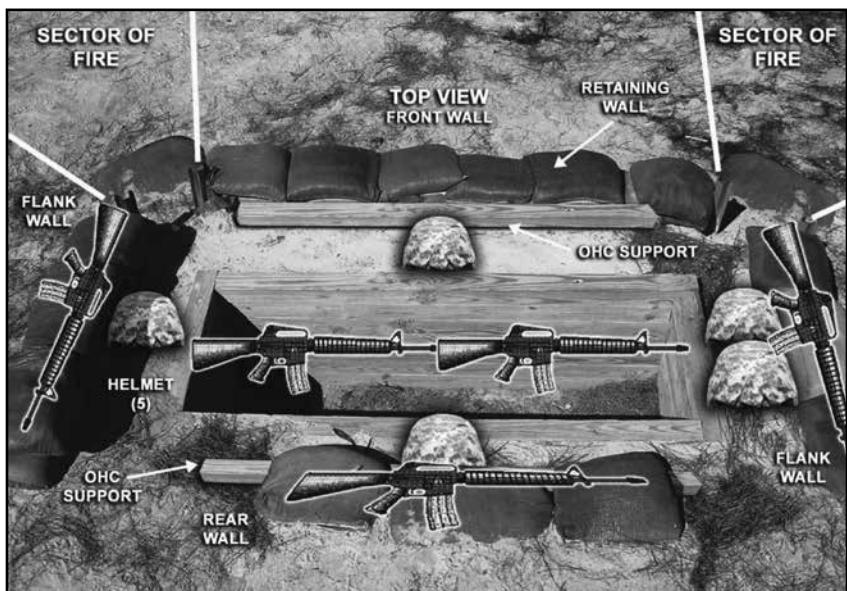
Placement of OHC supports and construction of retaining walls.
